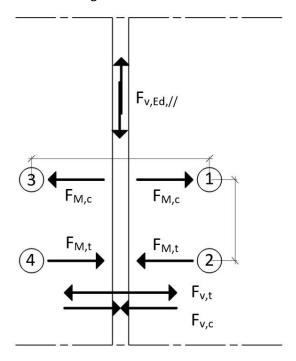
Forces on slab-beam connection, wind acting on the short side
